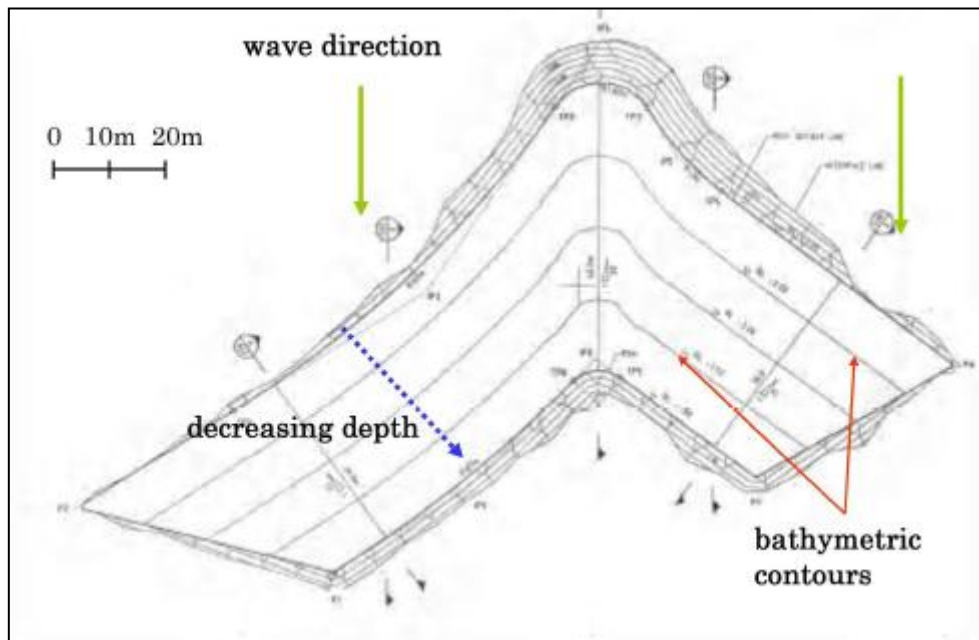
PLAN VIEW OF CABLE STATION REEF (JOHNSON, 2009)
